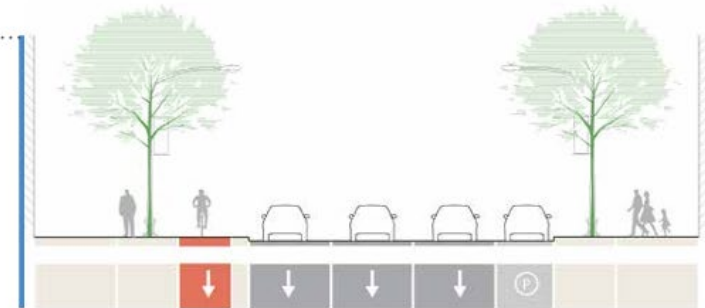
Fifth Street typical section Guadalupe Street to Brazos Street
